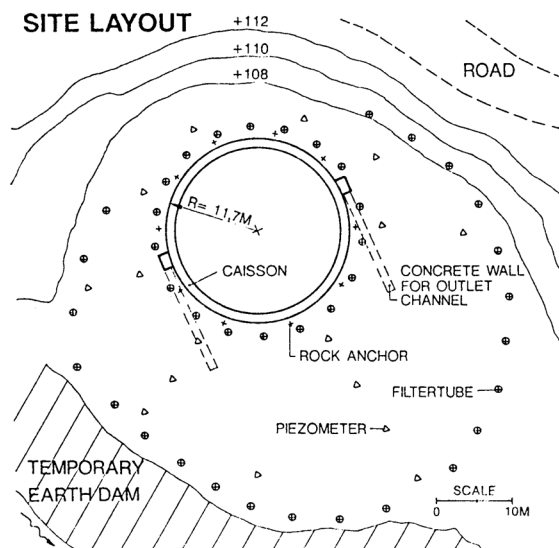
LAYOUT OF SITE FOR SHAFT SINKING.
